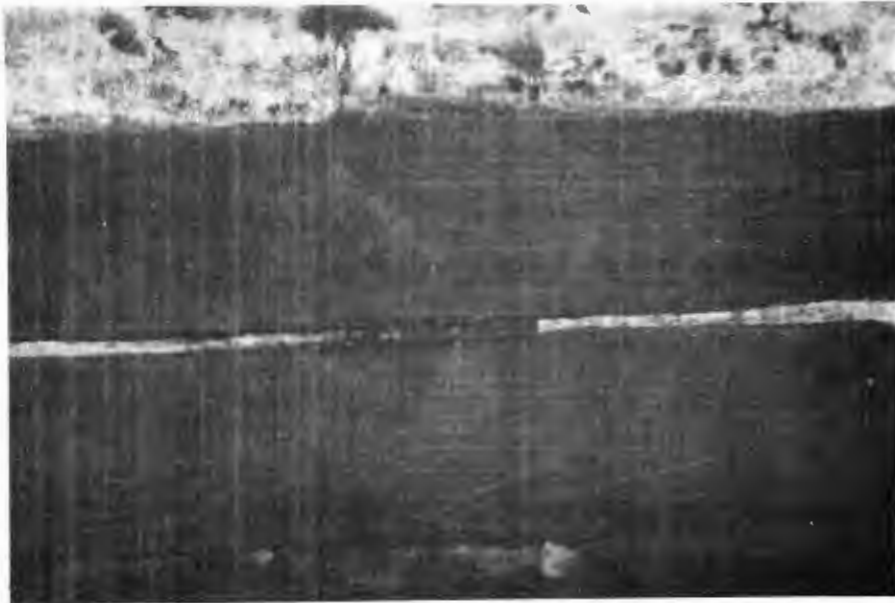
FRONTAL VIEW OF SHOTCRETE LAYERS IMMEDIATELY AFTER TRIMMING
